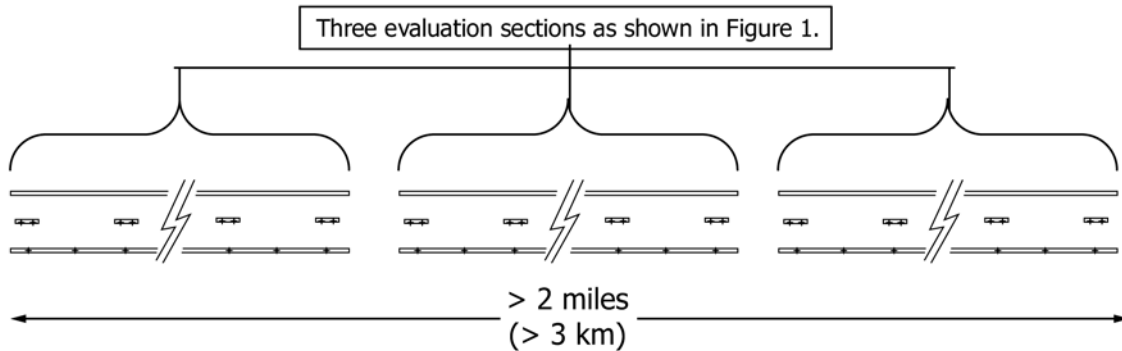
Typical Referee Evaluation Section Randomly Located within Pavement Marking Test Section More than 2 Miles [> 3 km]
